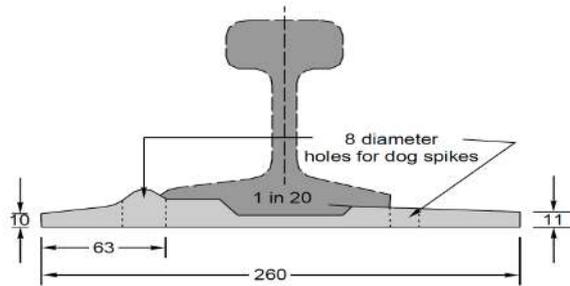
Canted MS bearing plate for 90 R (dimensions in mm)
